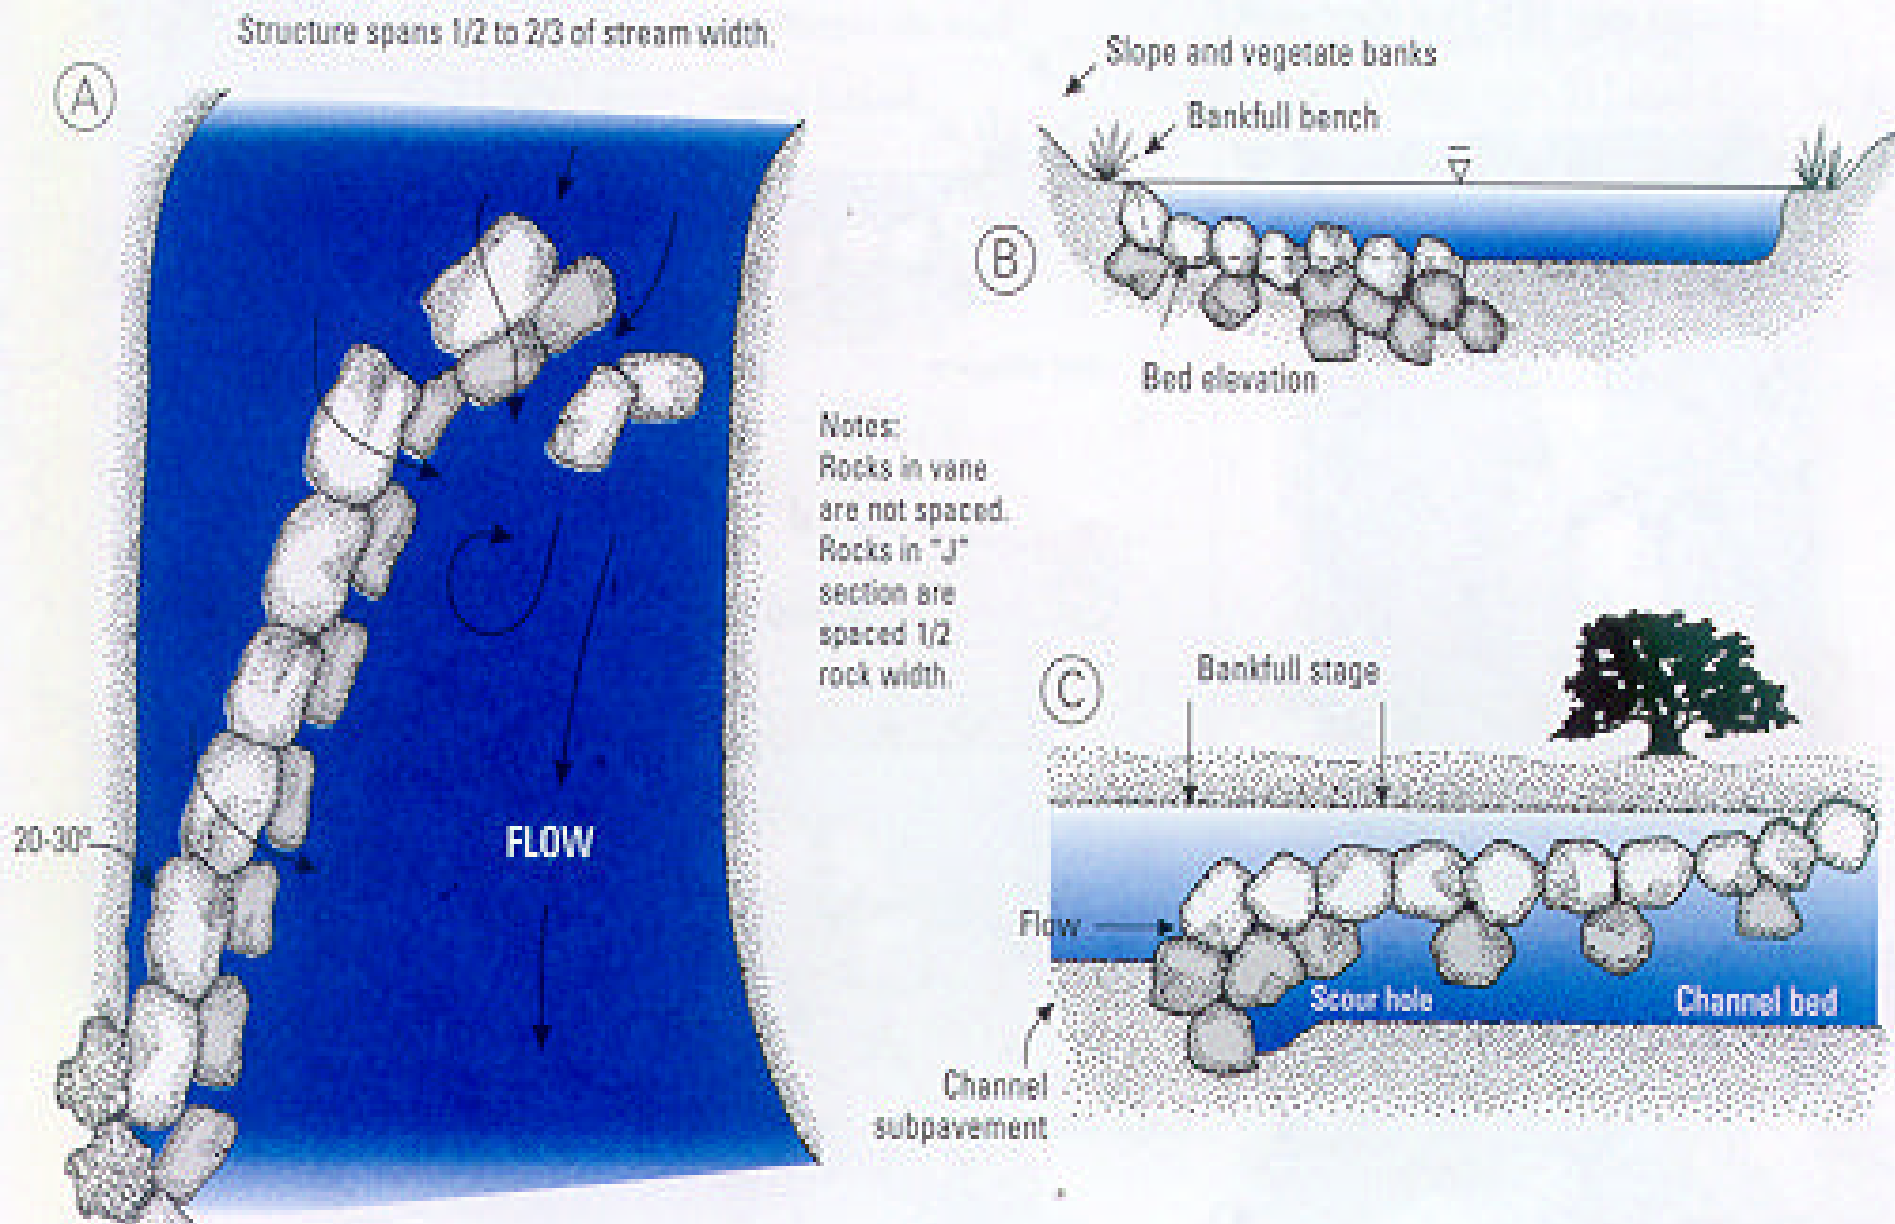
(a) Plan view, (b) cross-section, and (c) profile views of J-hook vana.
